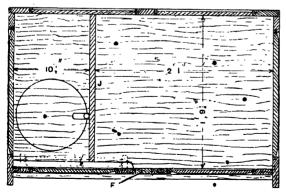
Horizontal Section through Bedroom Lavatory.
